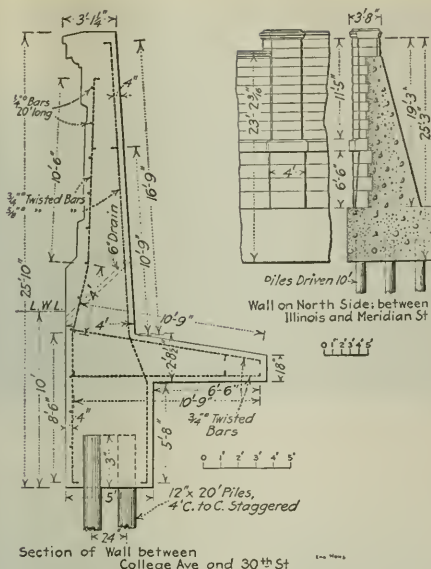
CROSS-SECTIONS OF RETAINING WALLS ALONG FALL CREEK
